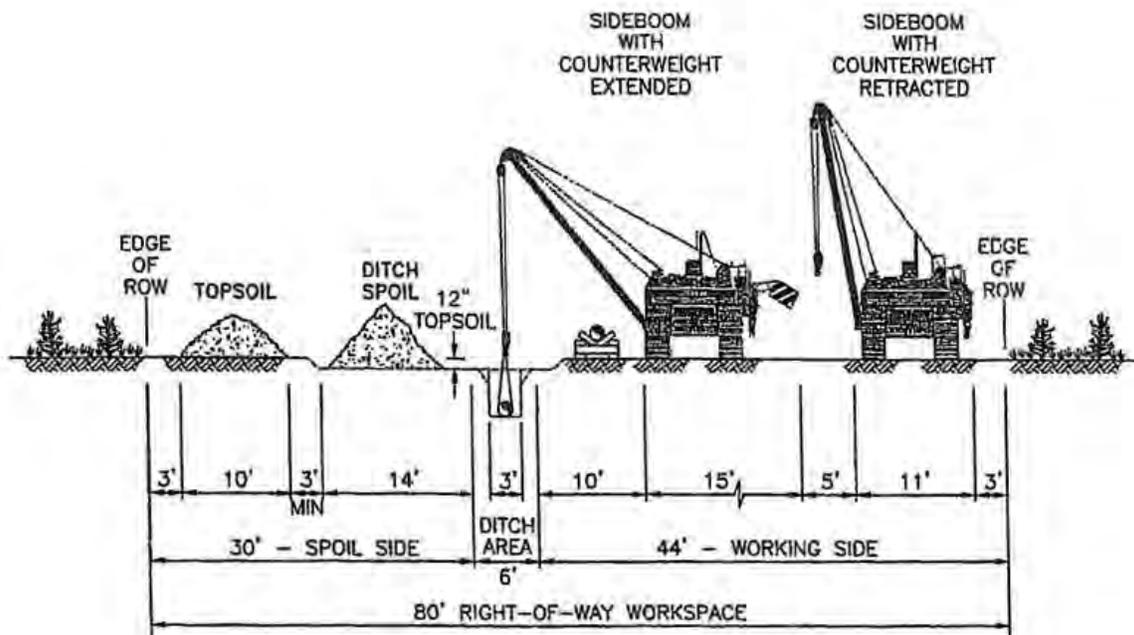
Recommended Construction Right-of-Way Cross Section
